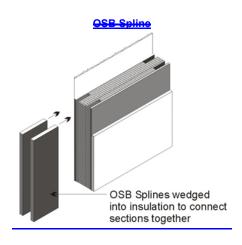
Structurally Insulated Wall Panels (SIPS)
